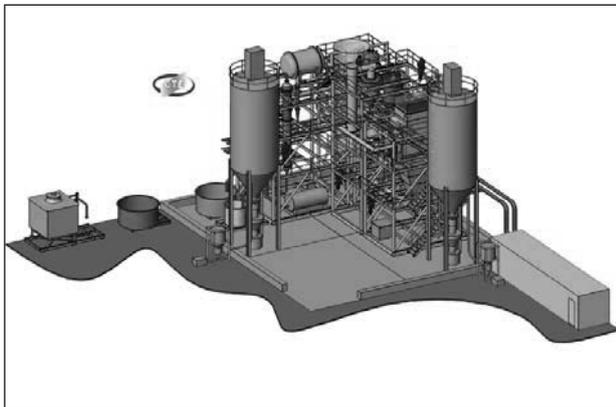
General arrangement drawing for the 2-stage calcination 1 tph pilot plant.
